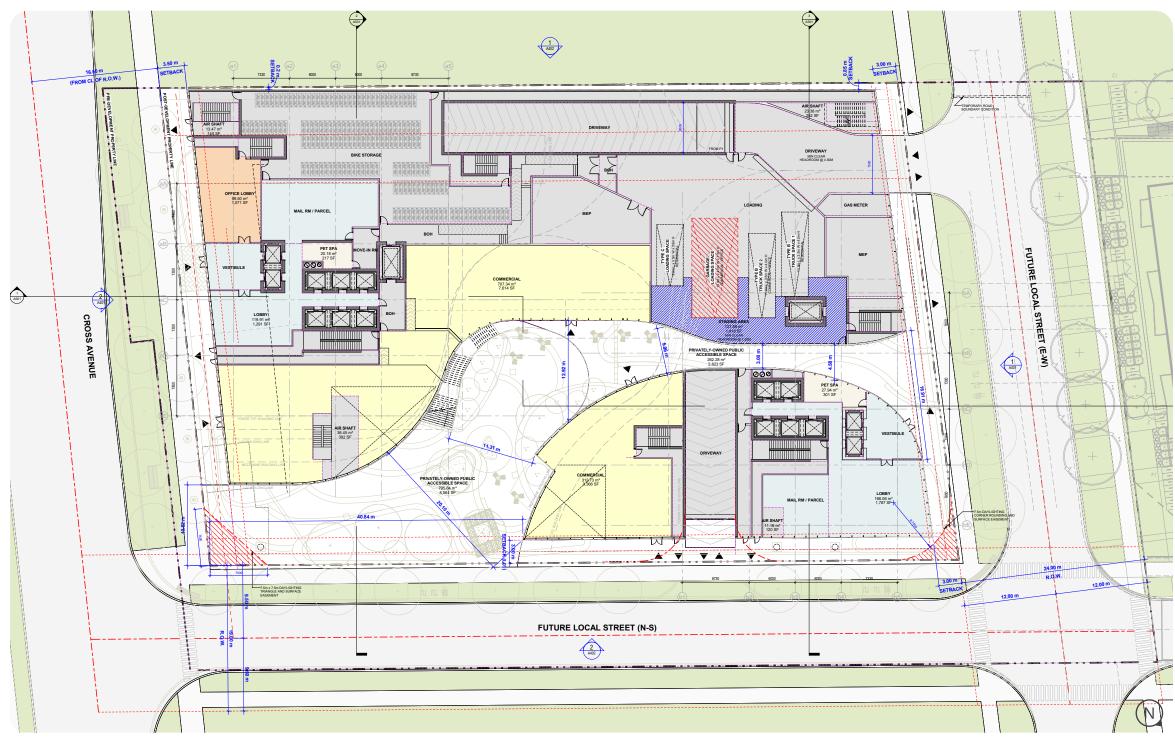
Ground Floor Plan (Provided by Teeple Architects)
